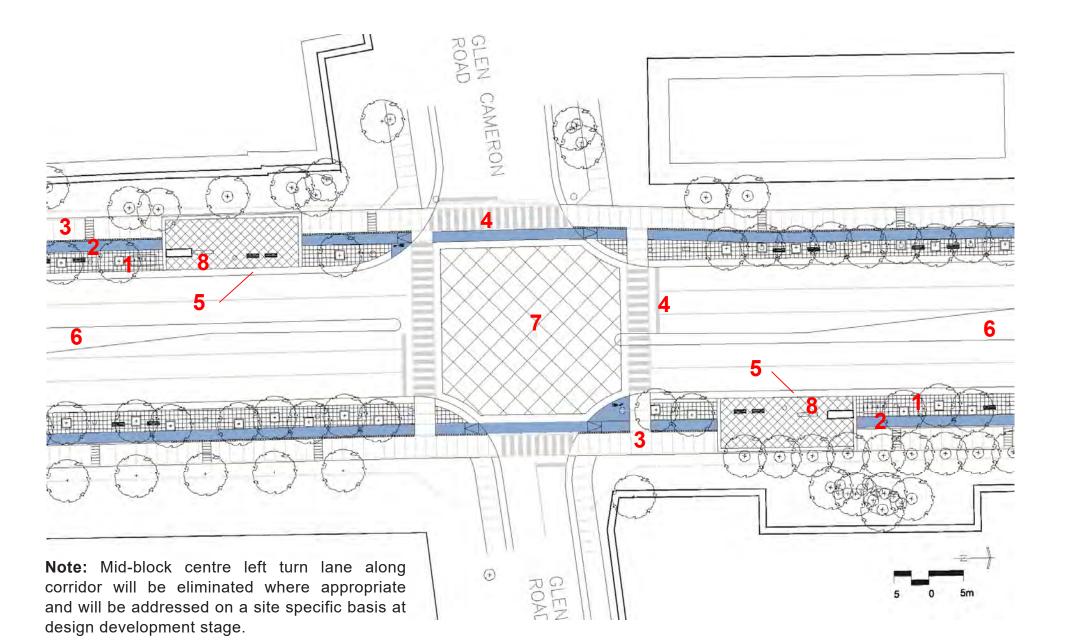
Detail Plan-Typical intersection w/In-boulevard Cycle Facility
